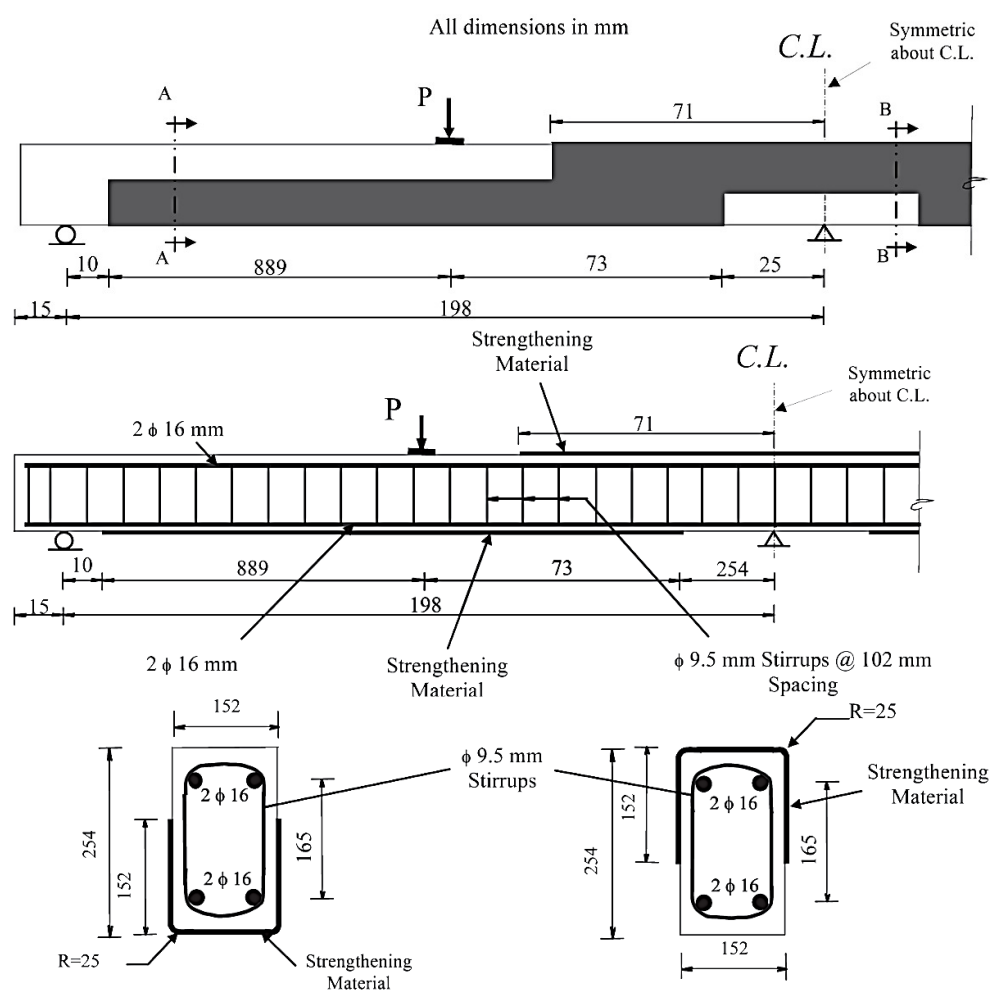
Beam specimens and specimen cross-sectional details (Grace et al., 2005).
